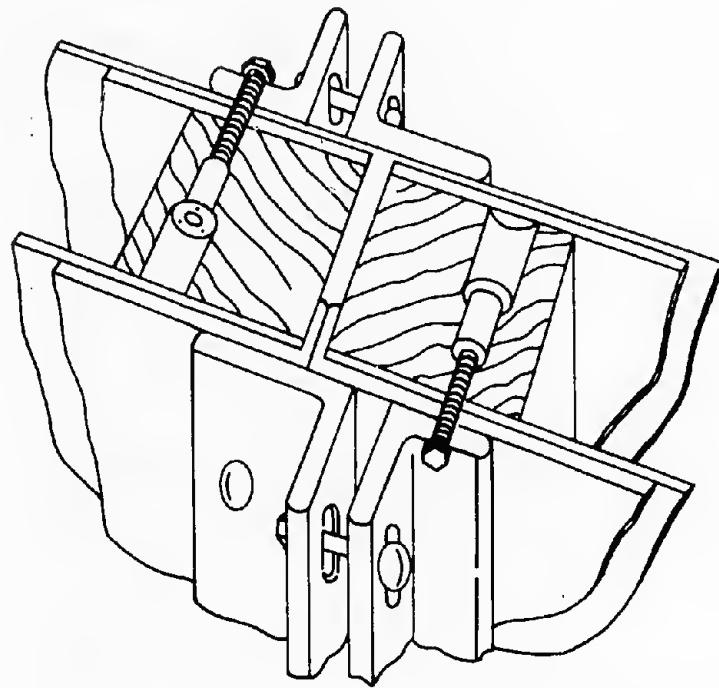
Typical panel-joining details for double electrically isolated enclosures.
